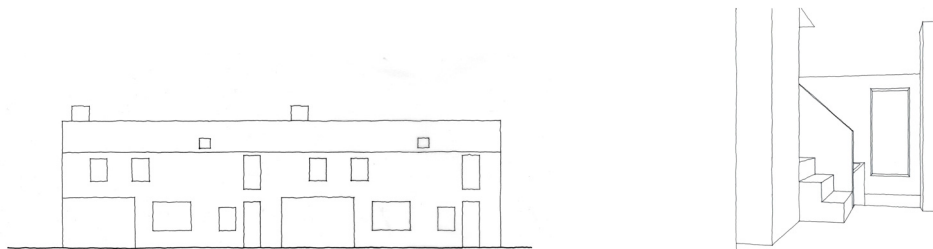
North elevation with simple openings and protrusions; Fig. 7.113 Interior perspective view looking through to living room of 3 bed house type
